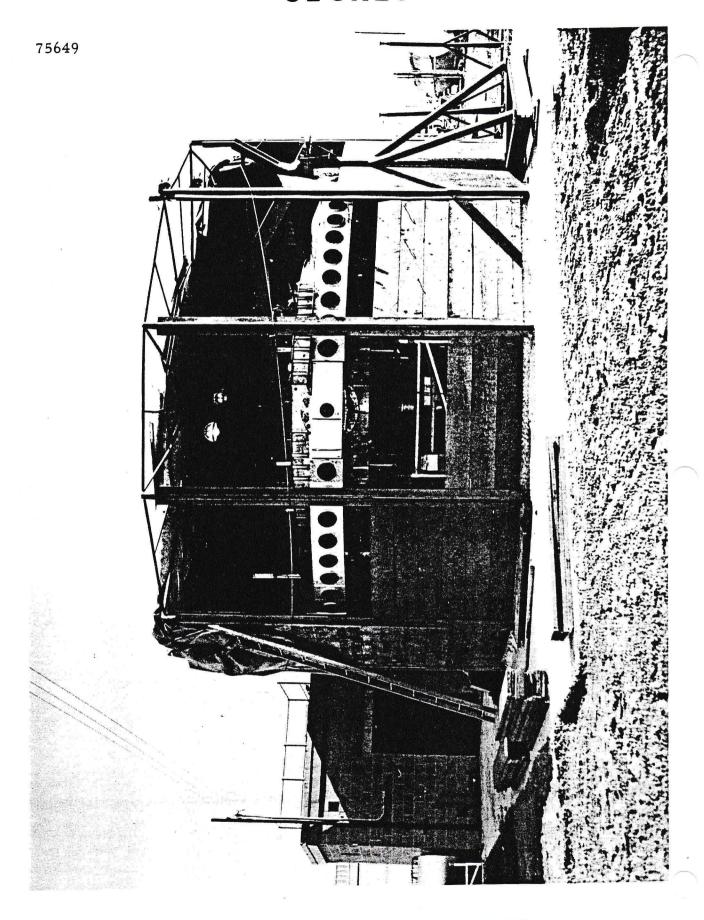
6-VIPER TEST RIG DURING ERECTION AT TEST SITE
